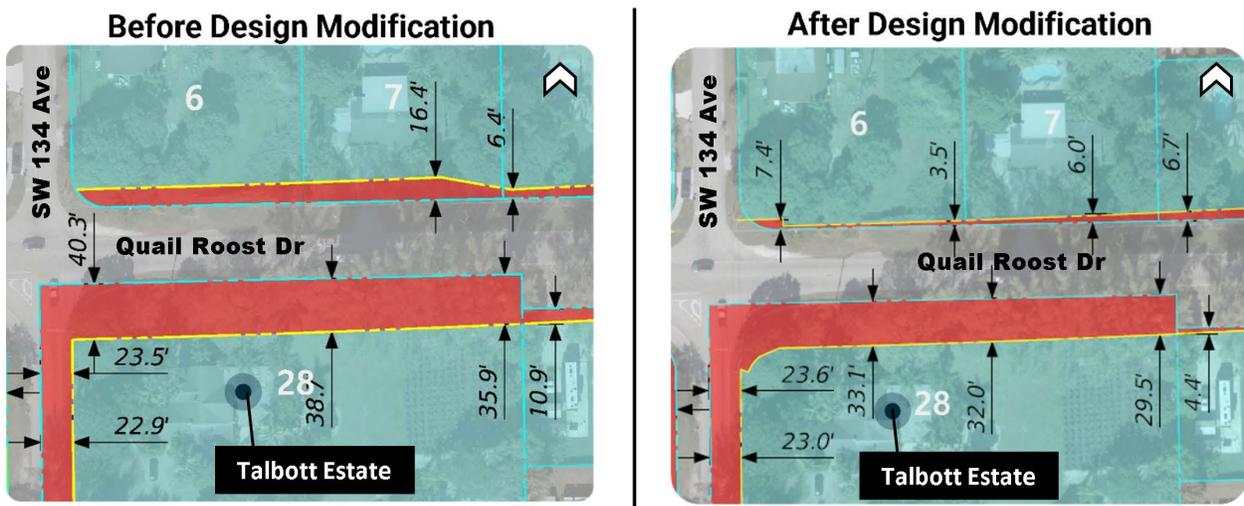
Build Alternative 2 Impact Minimization at SW 134th Avenue Intersection
